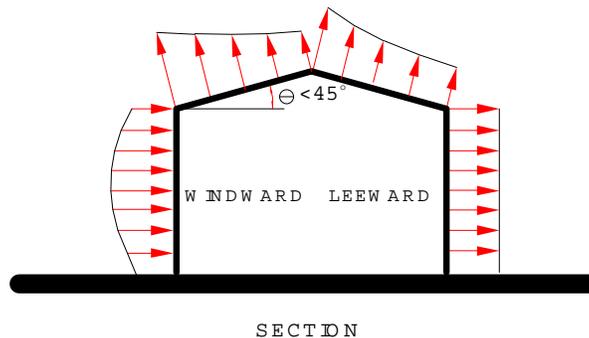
Wind Pressures on Low-Sloped Gable Roof
